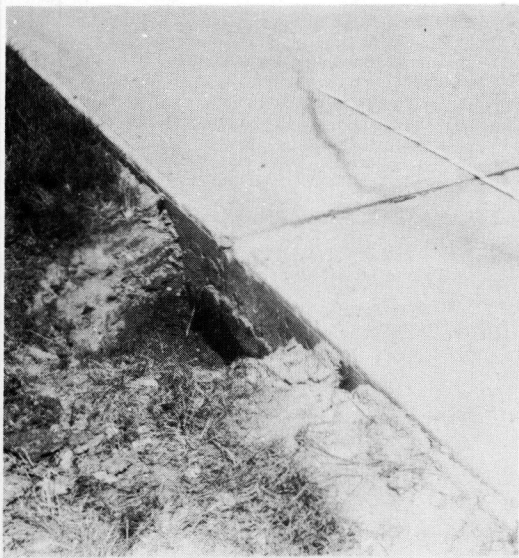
Edge-blows (first-stage) and restraint cracks on Indiana 67 at Station 858+75 of project F-130(7), east of Red Key. Water seepage in this area is from plugged underdrain constructed along the edge of the old pavement. Excavation of blow at joint shows bottom edge spall.
